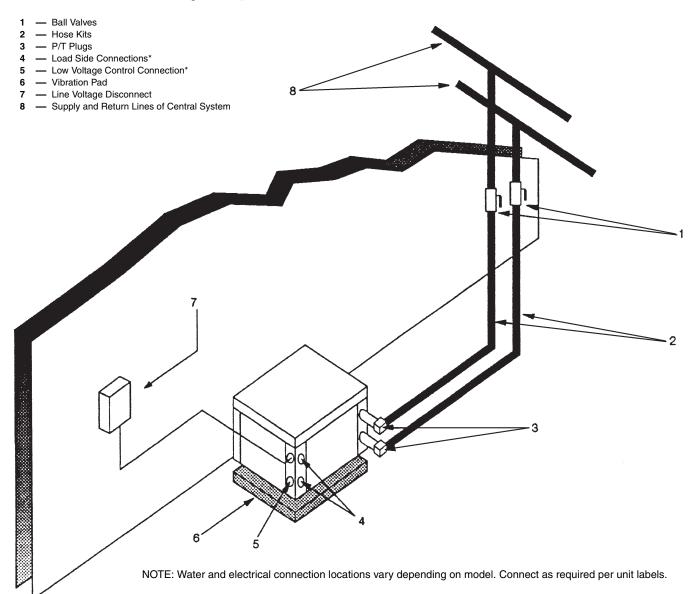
Typical Tower/Boiler Application (Source Side)
